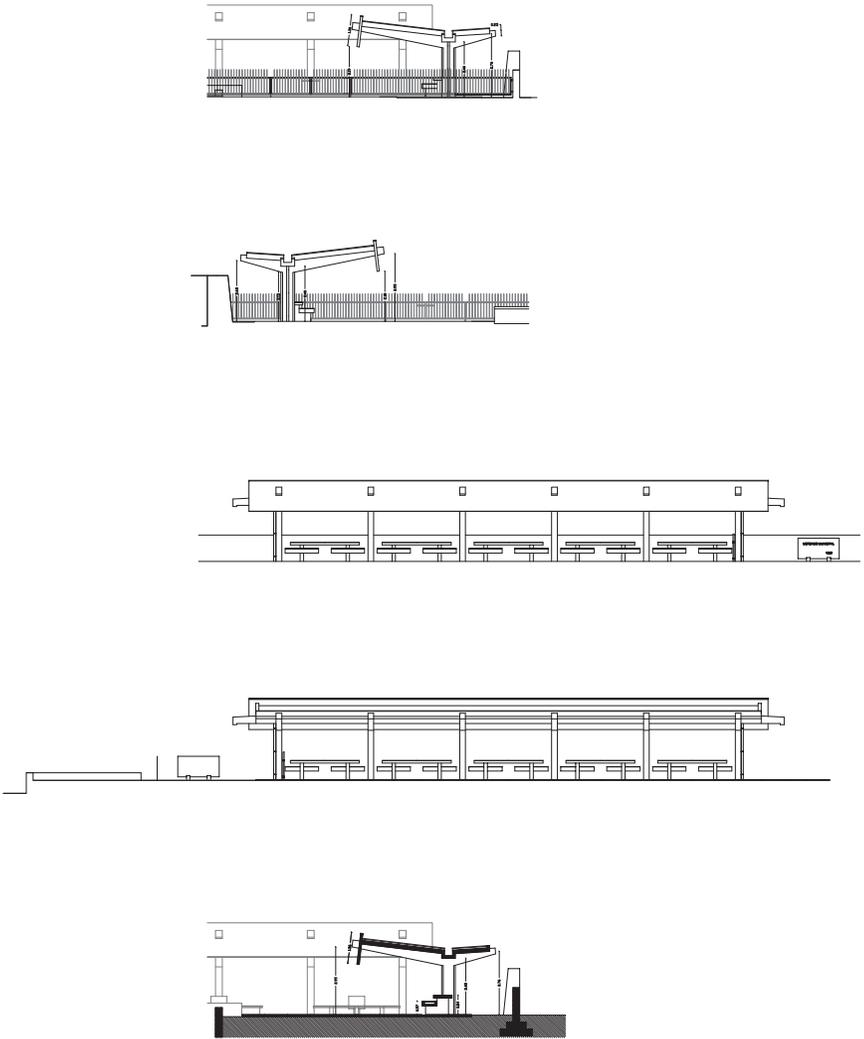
2015 Survey of the Municipal Market of Santa Maria da Feira; pavilion P4 elevations and section.
